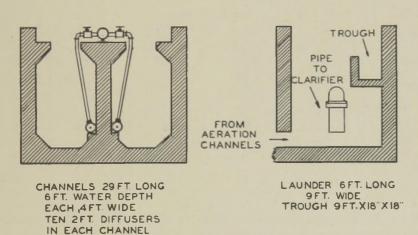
Sections of acration tanks at the South River Sewage Disposal Plant.
